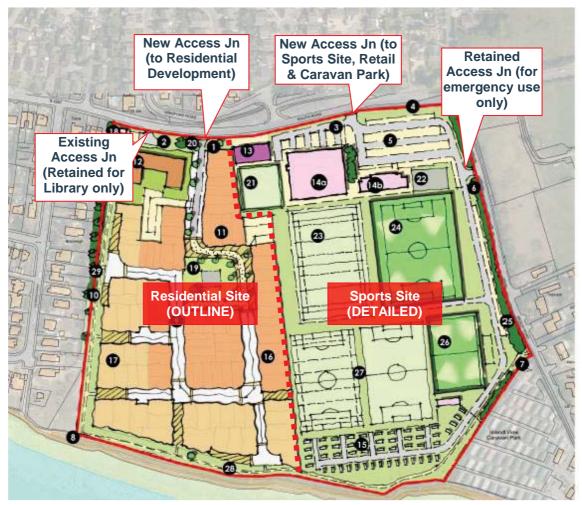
Development Site Extent and Location (Proposed Access Points)
